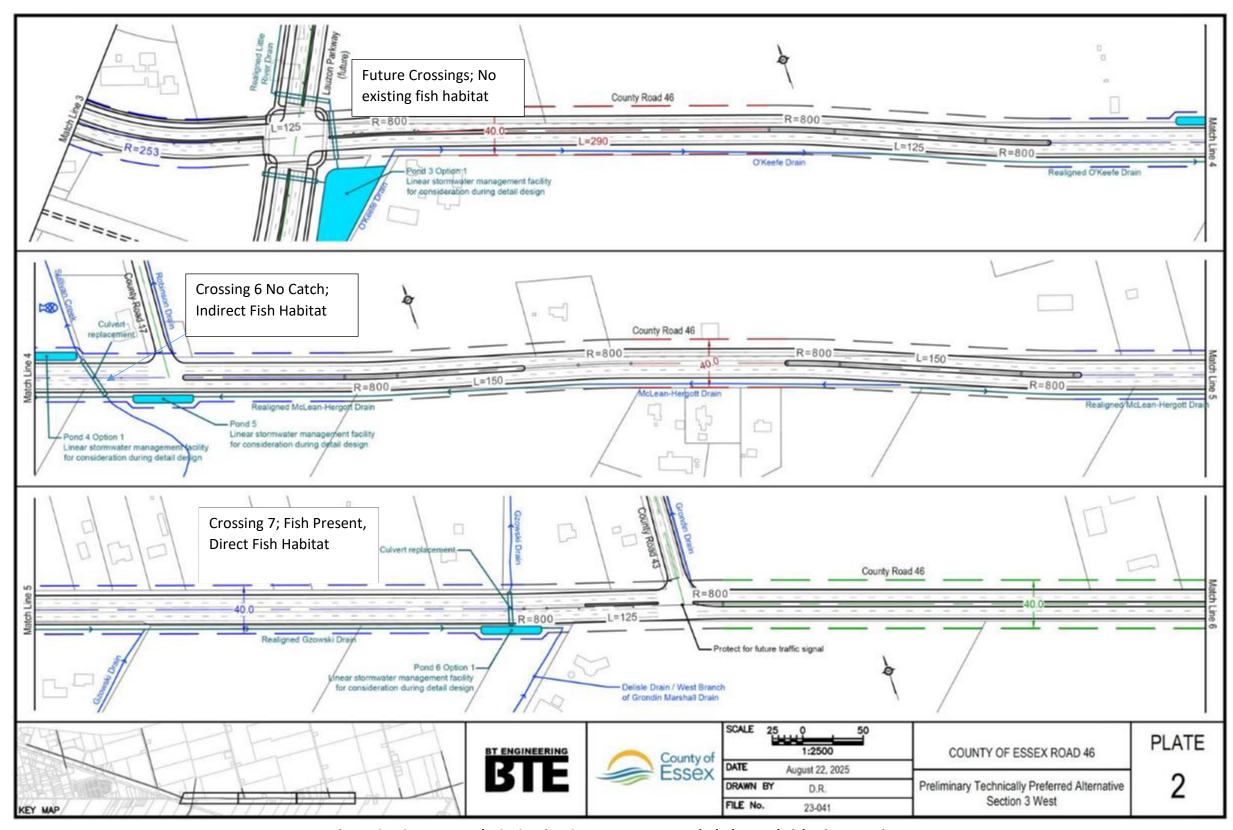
County Road 46 – Section 3 West Recommended Plan and Fisheries Locations
